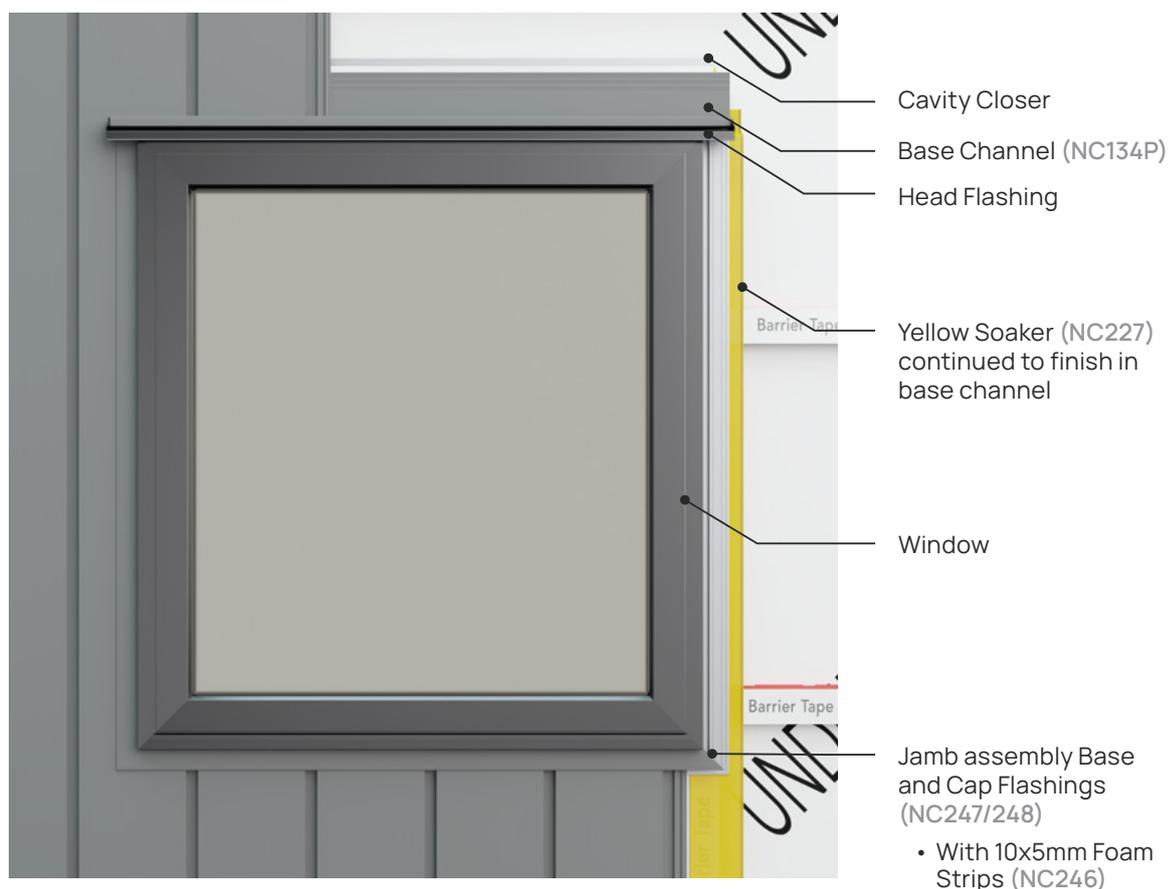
VERTICAL CLADDING TERMINATION CAP FLASHING INSTALLATION
